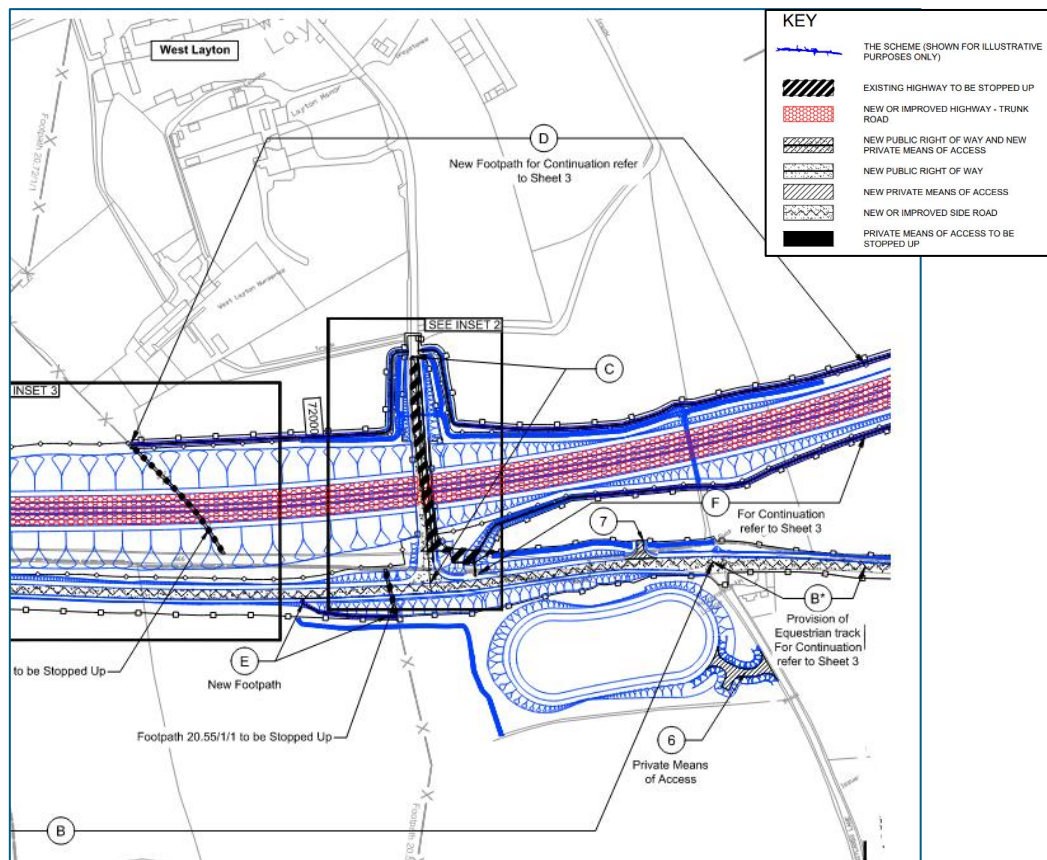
(c) Extract from Public Rights of Way Plan (After)
